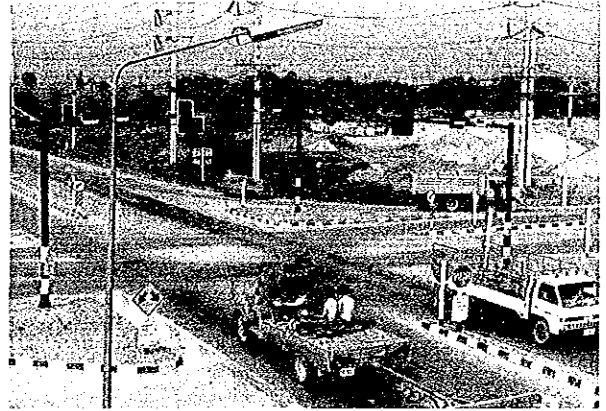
Grade Separation Plan at Laksi Roundabout
